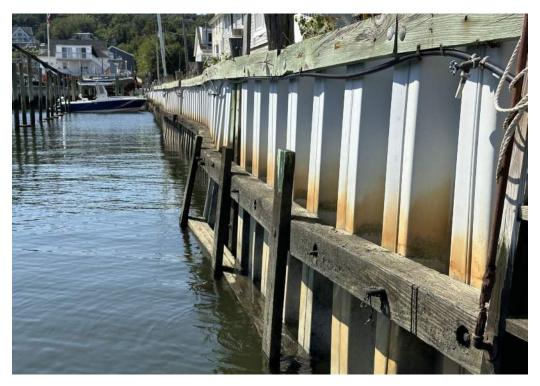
Section C, Westerly Bulkhead, Bowed Out Bulkhead Repair, View 3
